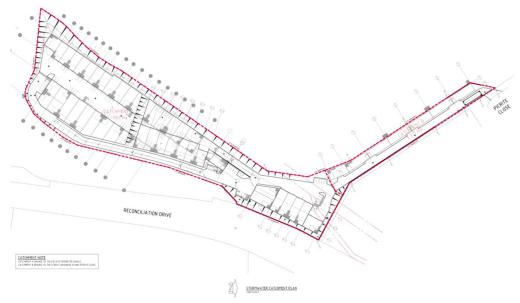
Stormwater Catchment Plan (Source: Costin Roe)
